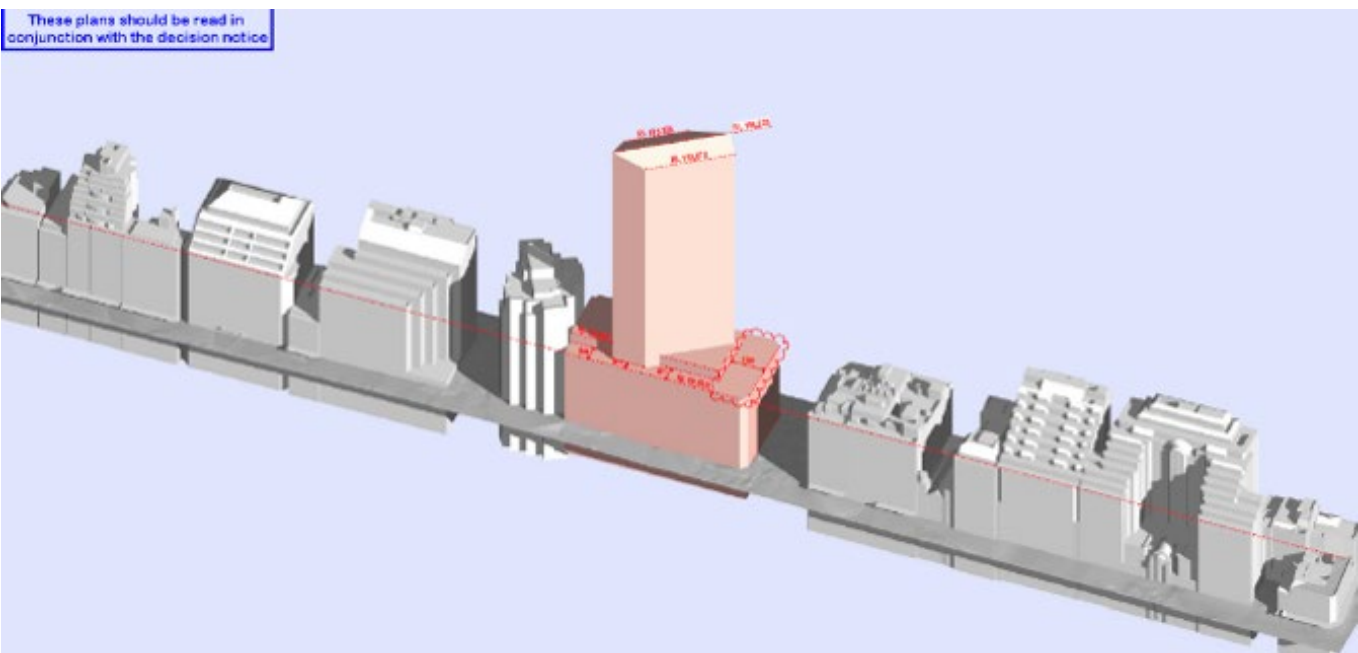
| Approved envelope north-south Elizabeth Street elevation for D/2017/349
